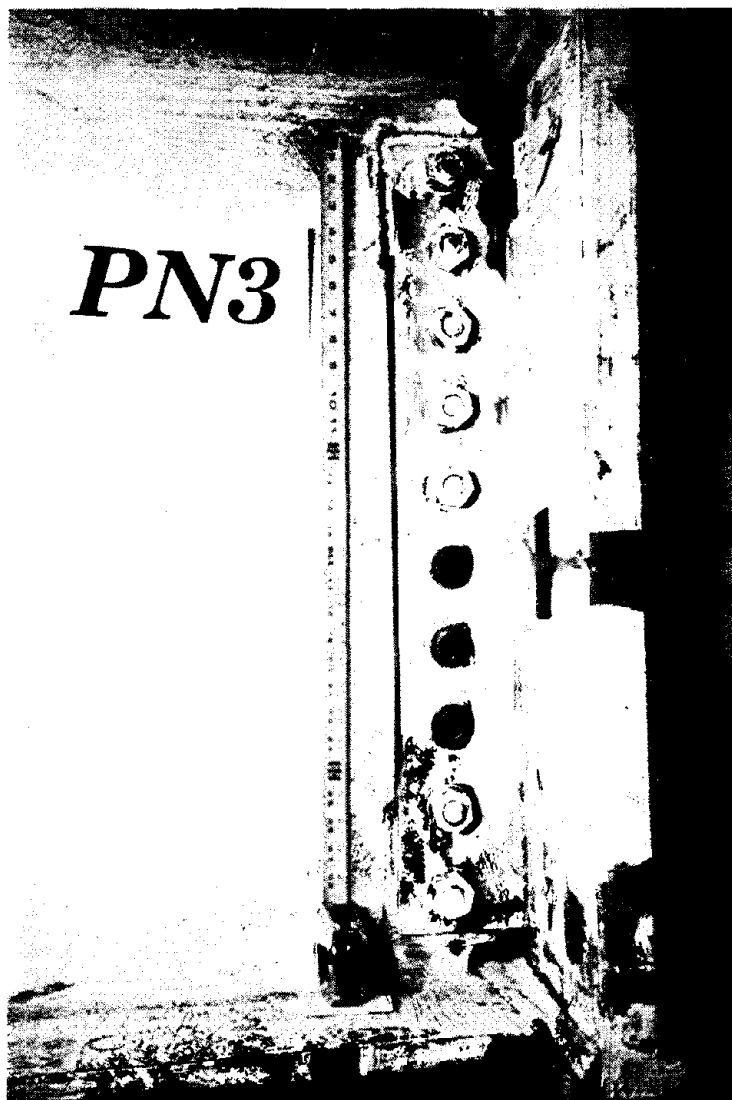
Damage to Shear Tab and Bottom Groove Weld
